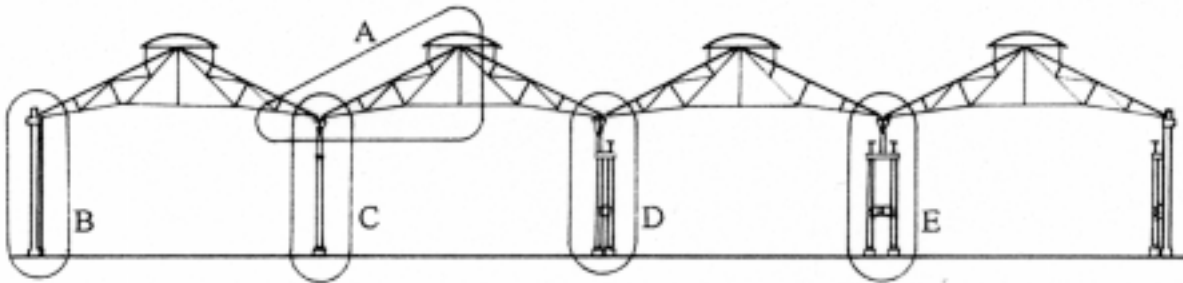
Sectional elevation Bays 1-4 showing the locations of the details above and below. Source: OC+P.
